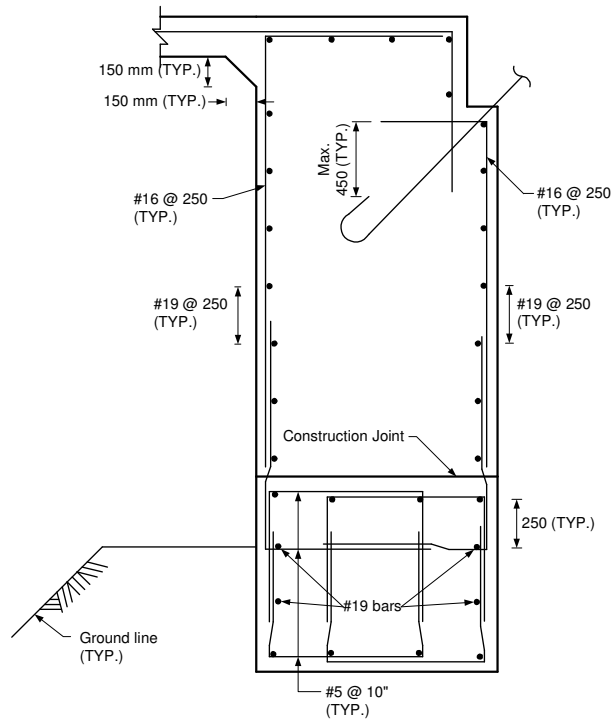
Integral Abutment Reinforcement, No Girder and No Pile at the Section
